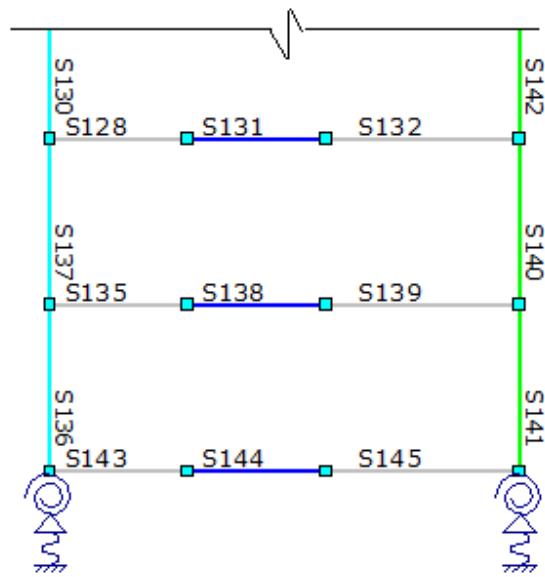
Equivalent frame of the walls on Elastic foundation with base beam
